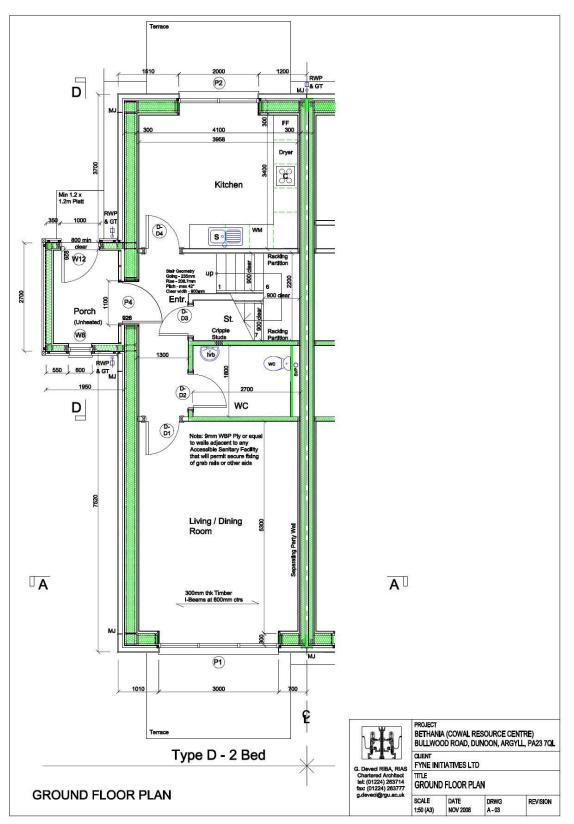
Ground Floor Plan of the Dunoon Passive House (source: Fyne Homes)
